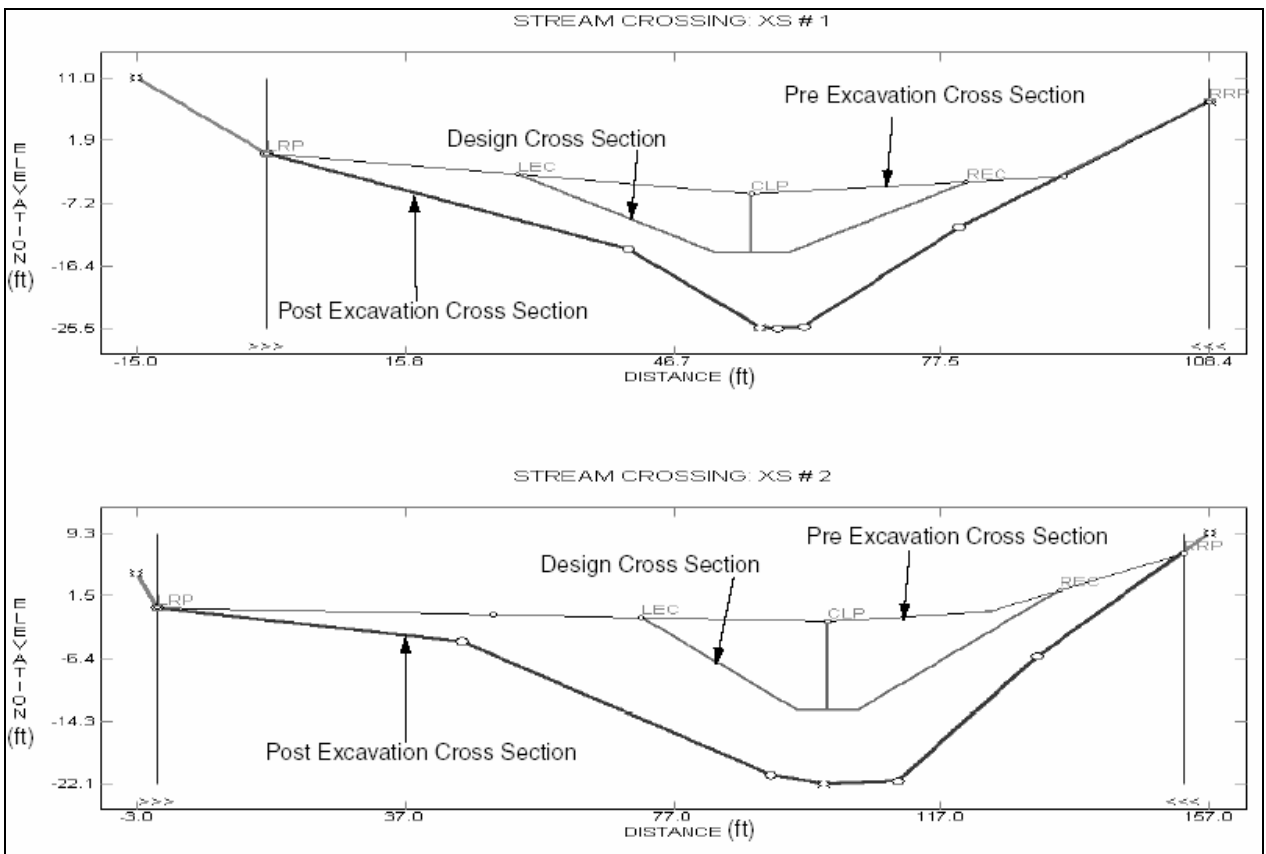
Redwood Creek 1305 Road Site #11 – Stream Crossing Pre & Post Excavation Cross Sections.
